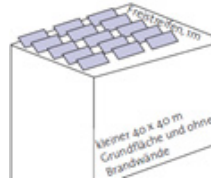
Create access to the roof truss for smaller flat roofs without via free strip on the longer side
